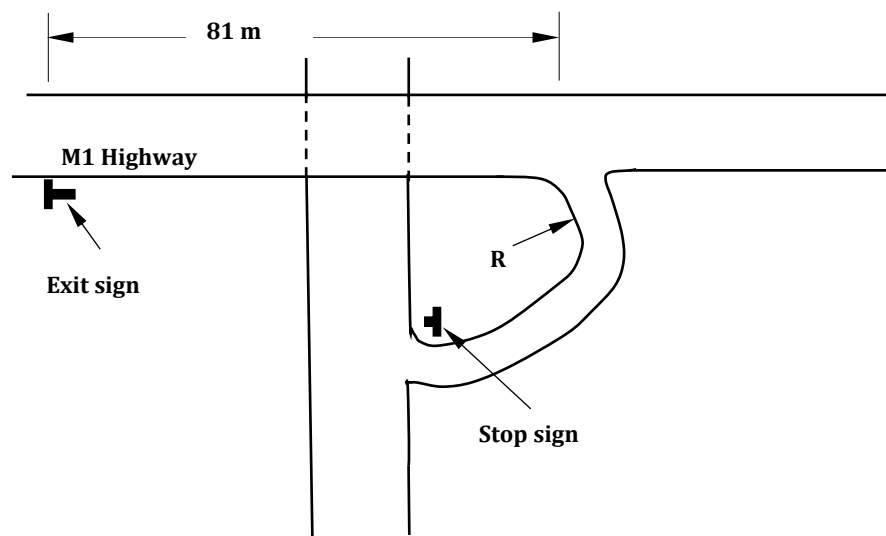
Layout of M1 Highway Ramp and a Local Street
